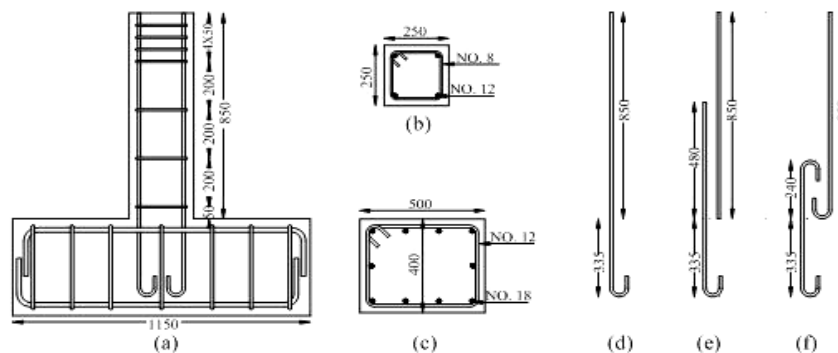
Details of specimens: (a) typical specimen dimensions and reinforcement view, (b) typical column section, (c) typical foundation section, (d) typical WOS longitudinal bar, (e) typical SOS longitudinal bar, (f) typical HOS longitudinal bar
